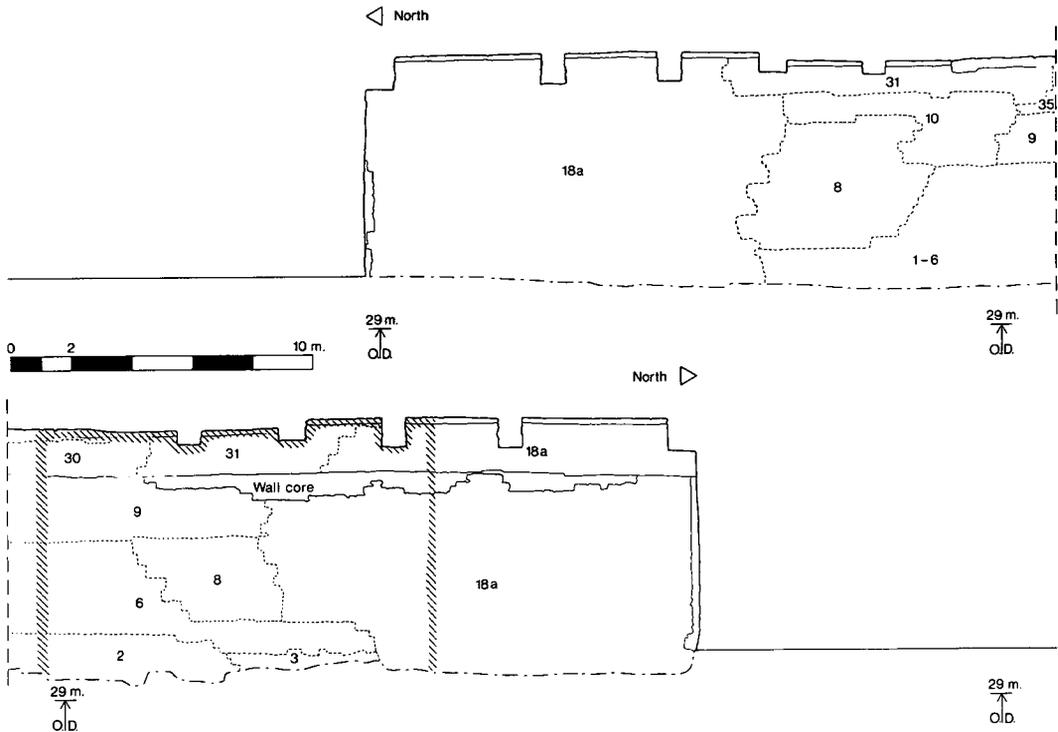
Town Wall, Orchard Street: phased elevation section 2-3. For detail of masonry within shaded areas on figs. 3-6 see fig. 2.
